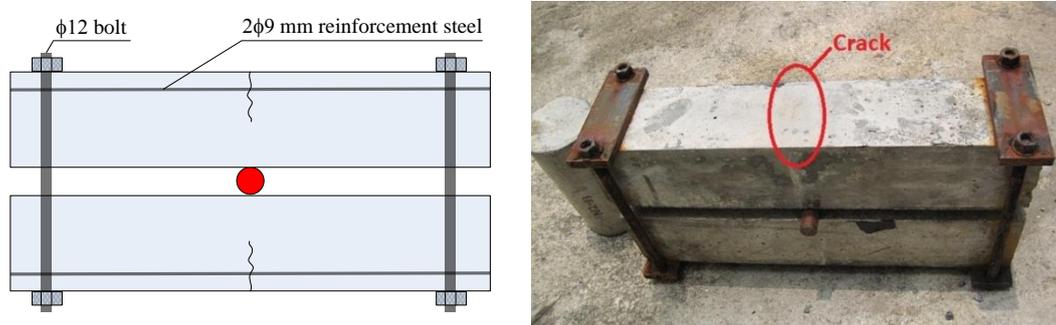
The back-to-back pair of reinforced concrete beams immersed into salt solution
